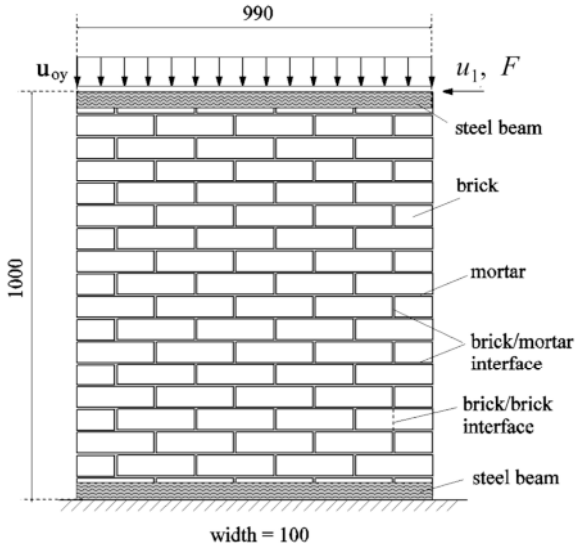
Masonry panel loaded in compression and shear: geometry and loading (dimensions in mm).
